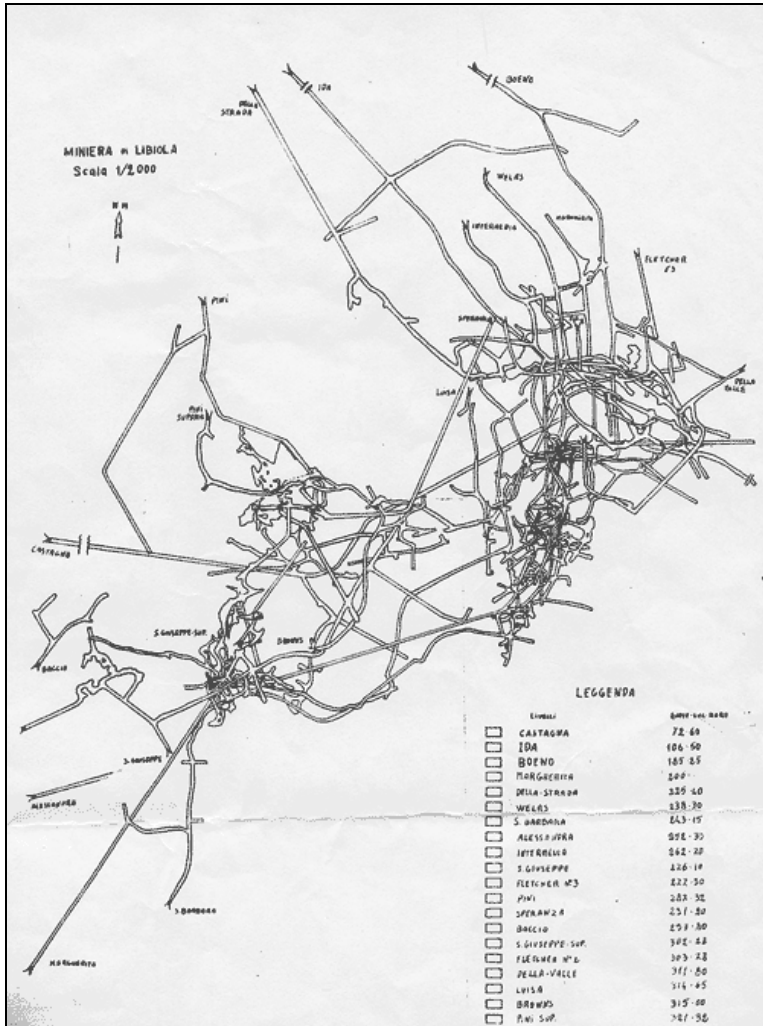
Schematic sketch of the underground works in Libiola mining site
